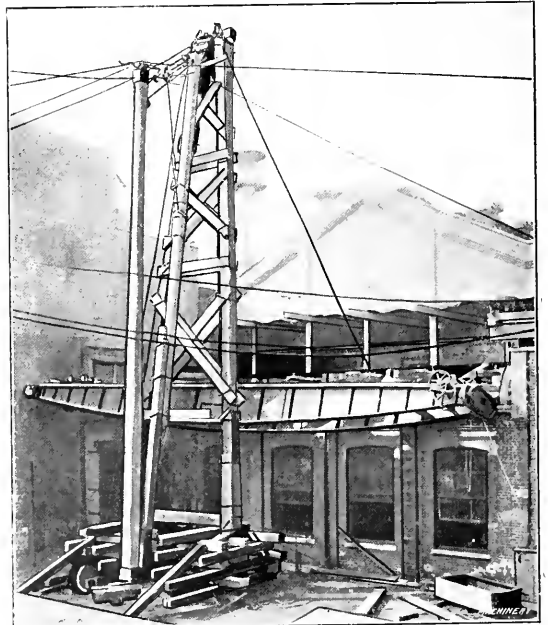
New Crane inside Building and Old Crane being lowered to the Ground
